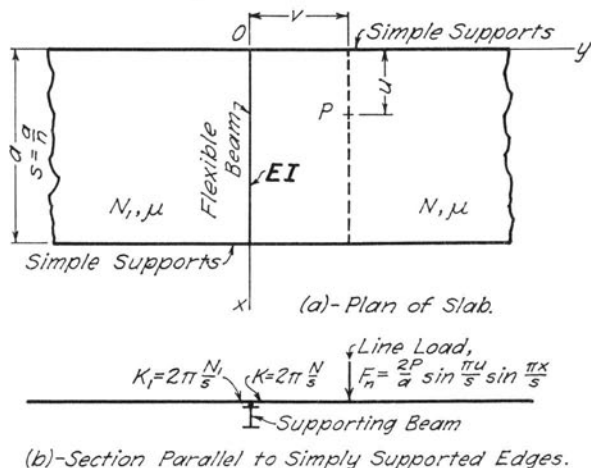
CONCENTRATED LOAD ON INFINITELY LONG SLAB WITH ONE FLEXIBLE BEAM
